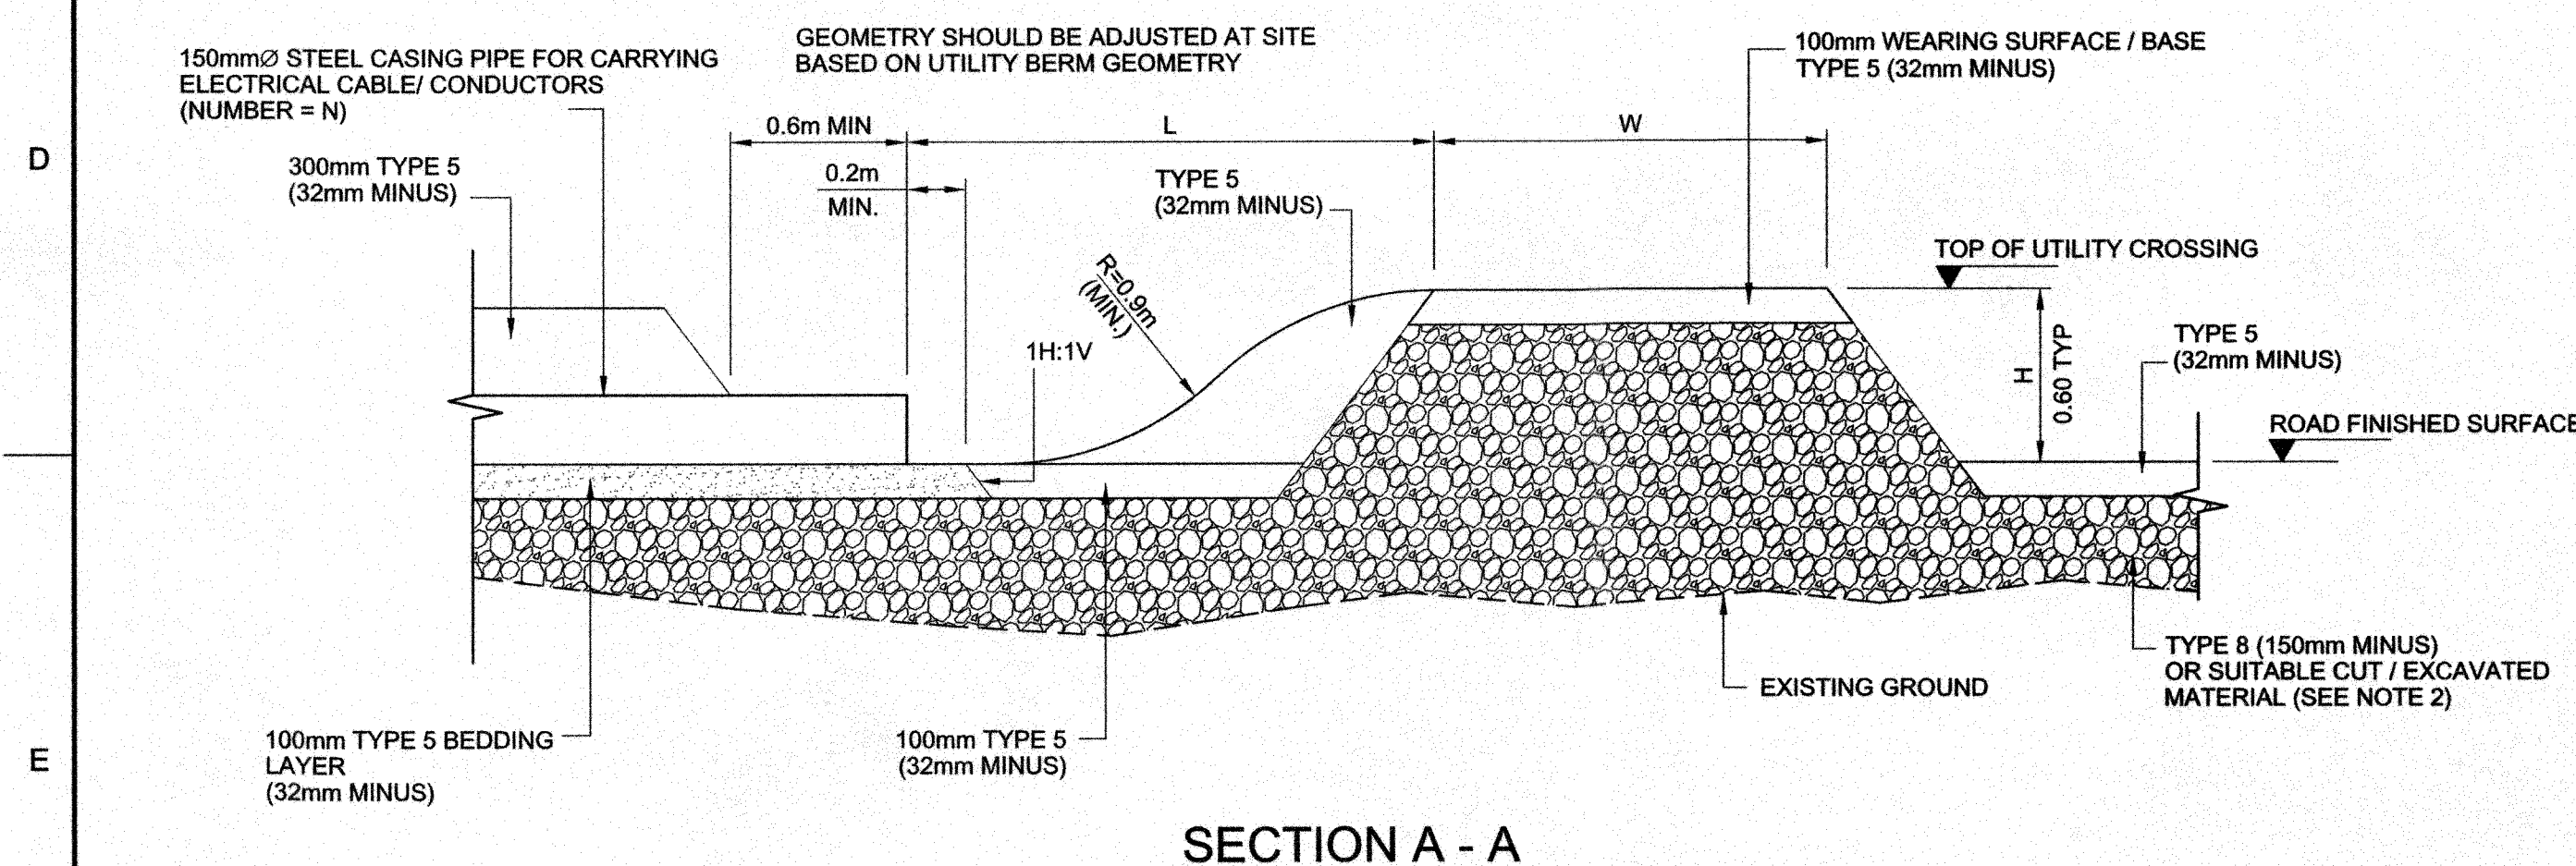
ROAD UTILITY BERM CROSSING
